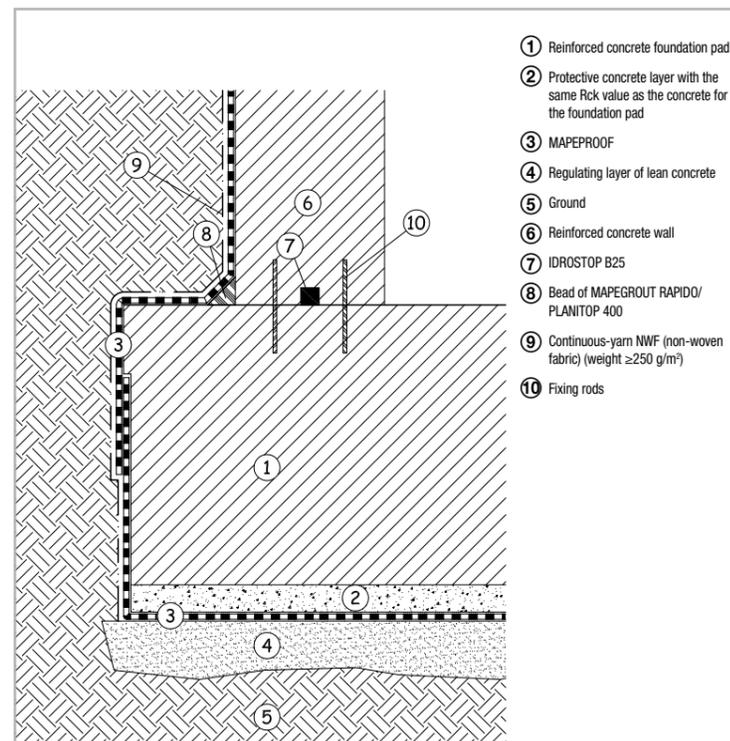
DETAILED LAYOUT OF WATERPROOFING AFTER CASTING WITH MAPEPROOF
